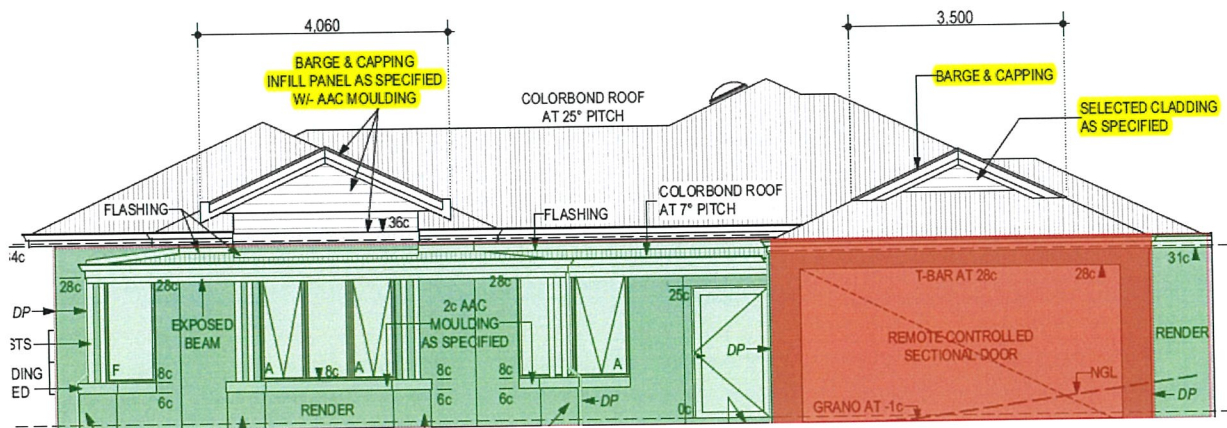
Proposed street facing elevation from Whitfeld Street, with the main garage façade highlighted in red, and the remaining facades highlighted in green.
